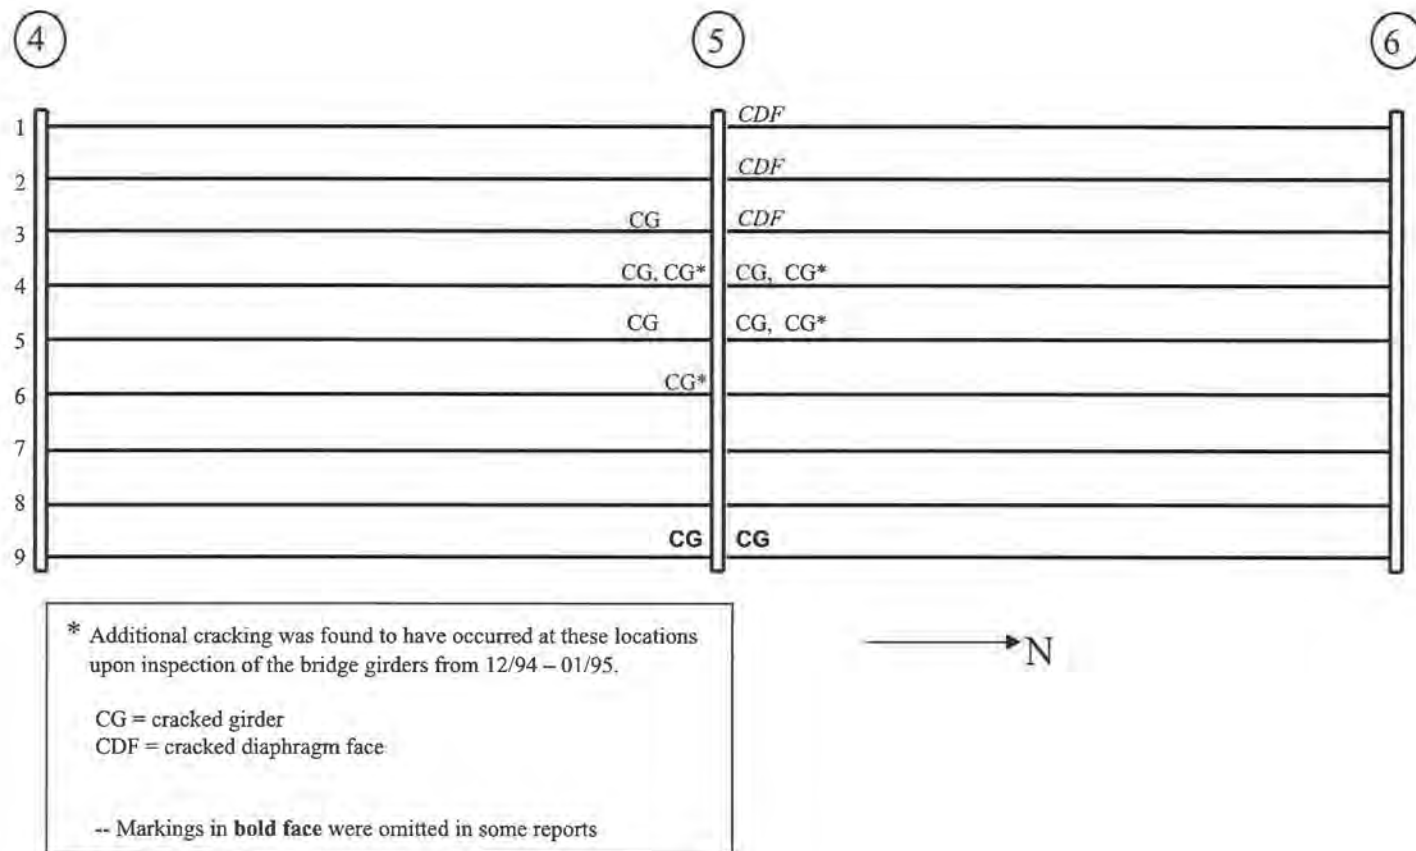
Cracking in Bulb-tee Girders in Northbound Spans 4 and 5 (ALDOT 1994a)
